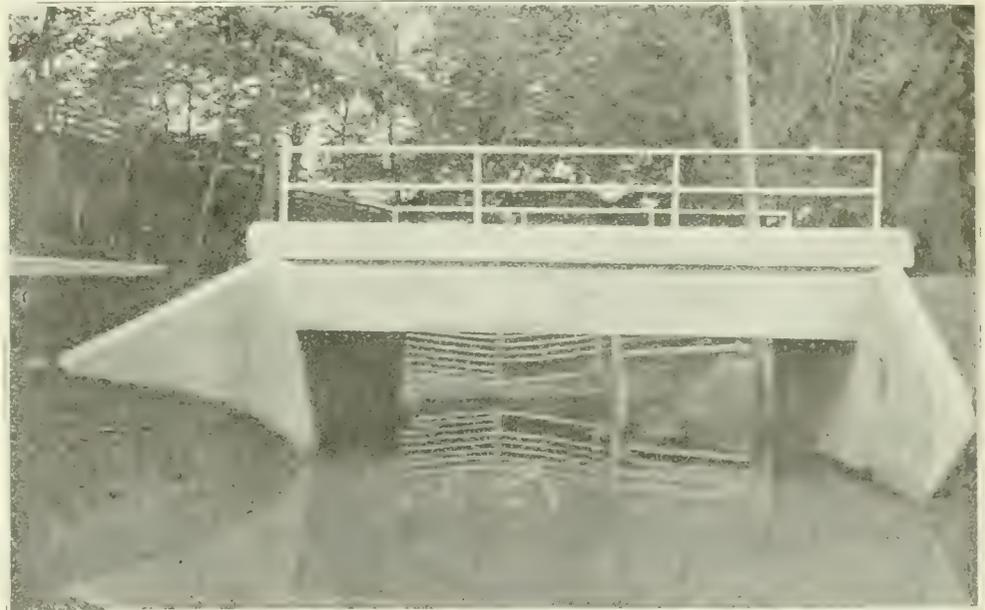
View Showing Typical Slab and Beam Concrete Culvert.
